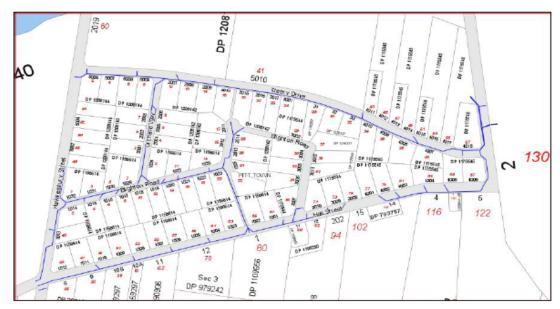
Location of the pipe network provided within and adjacent to sub-catchment 2A
